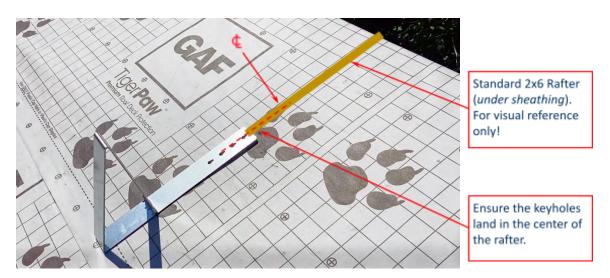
POSITION THE STAGER (OVER THE RAFTER'S CENTERLINE)
